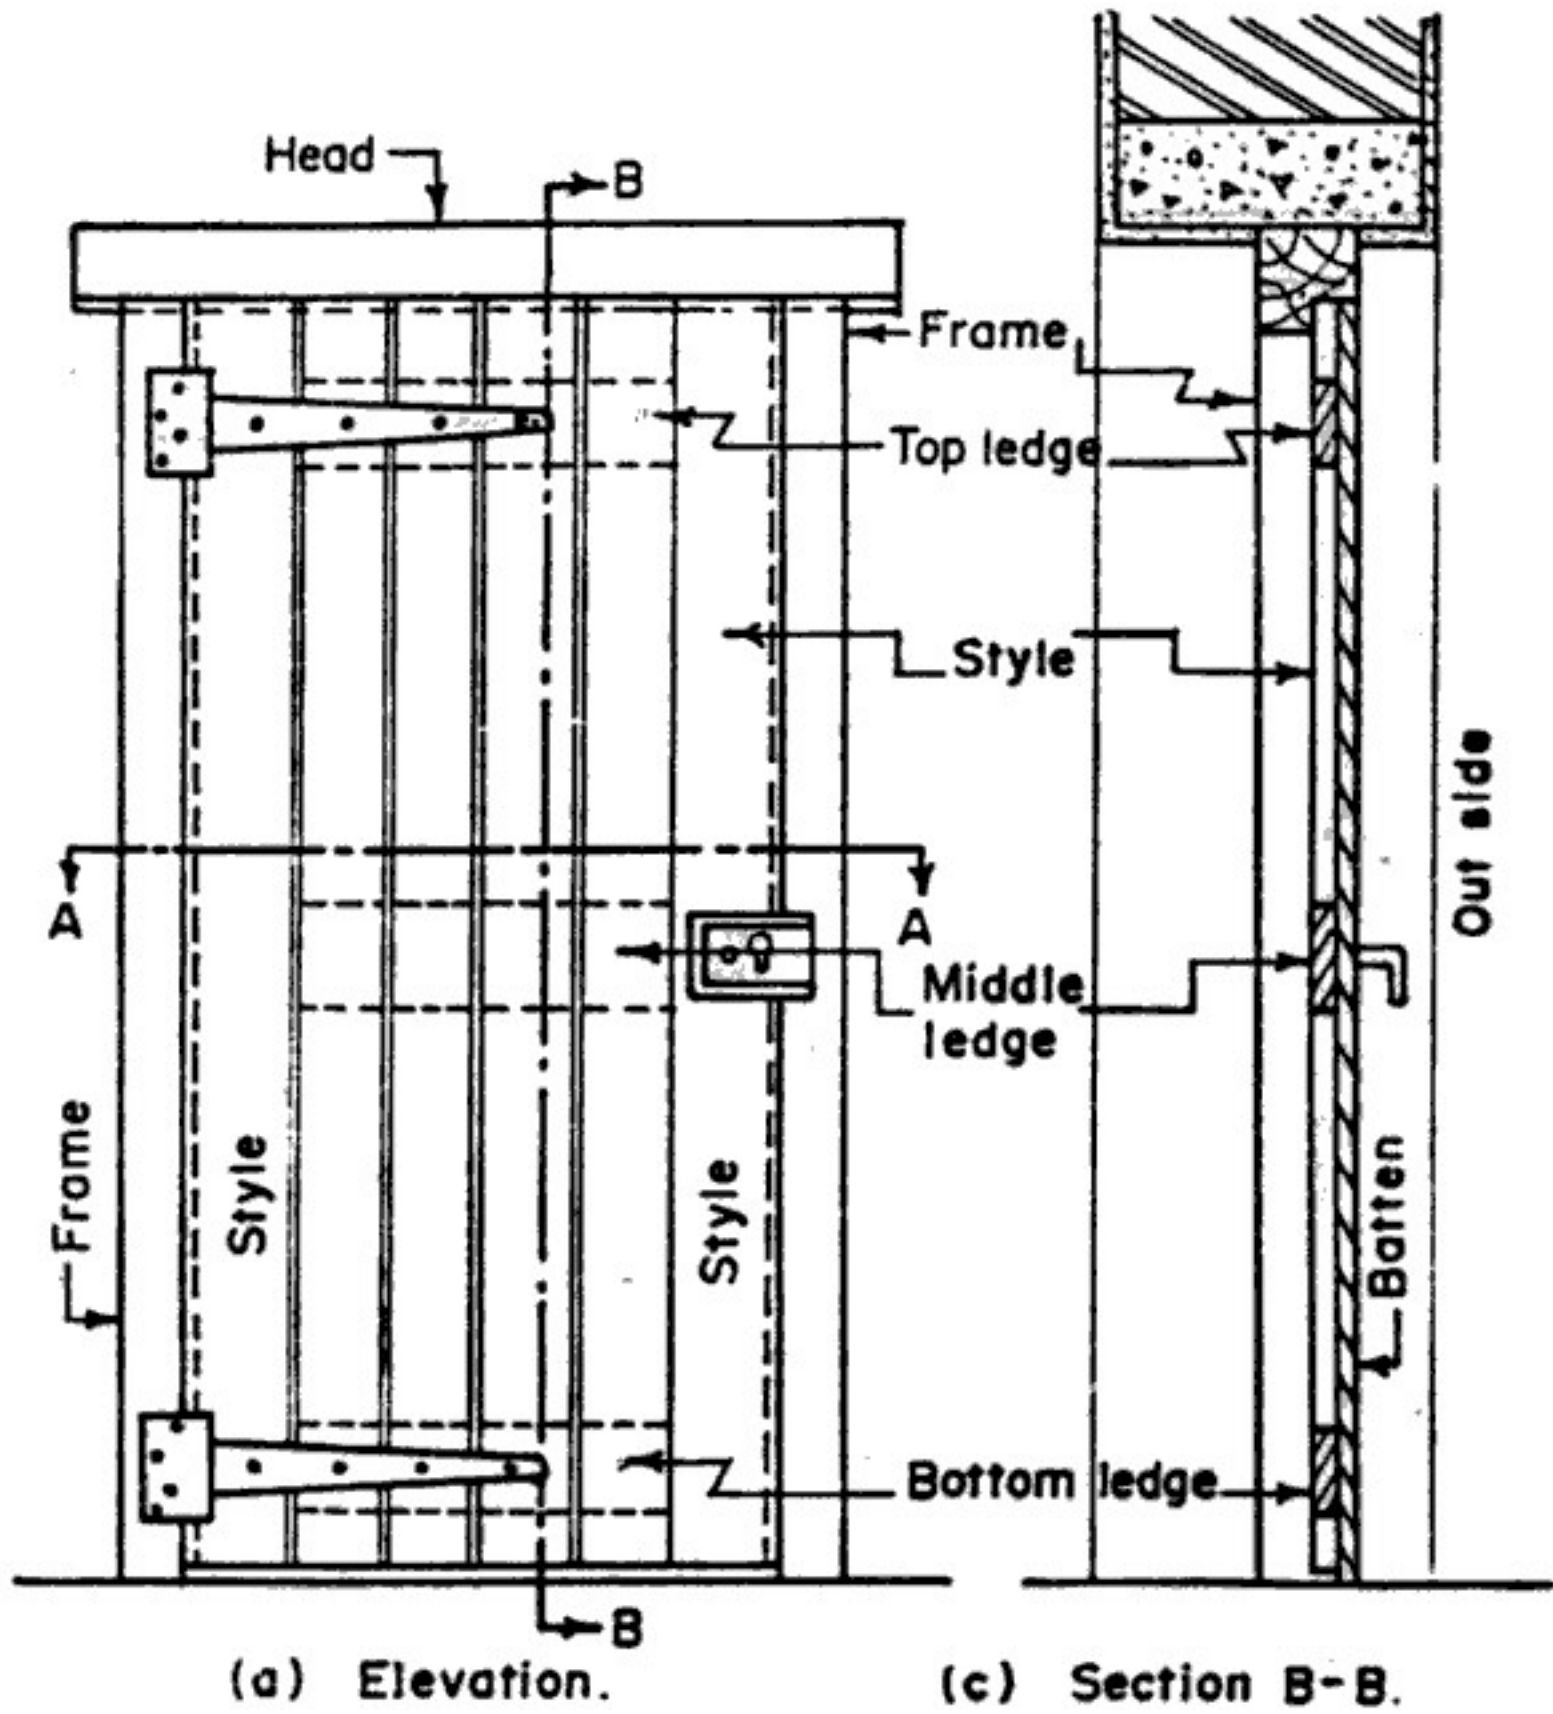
BATTENED, LEDGED AND FRAMED DOOR.
